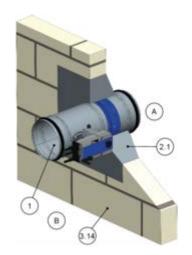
Mortar-based installation in solid wall - installation not flush with wall
